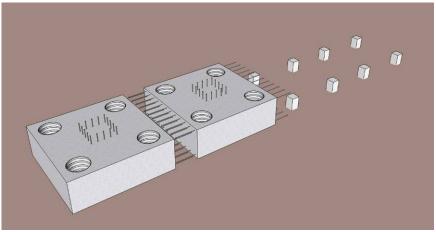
Precast Pile Cap Footing (with corrugated steel pipe void connection)
